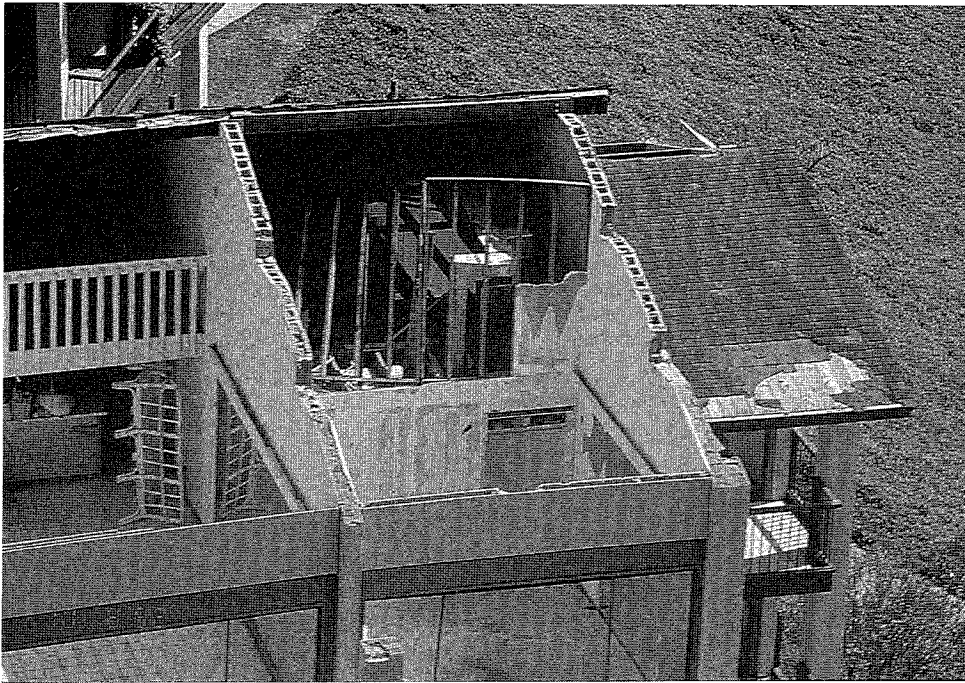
Heavy timber and plank roof blown away due to inadequate tie downs.
